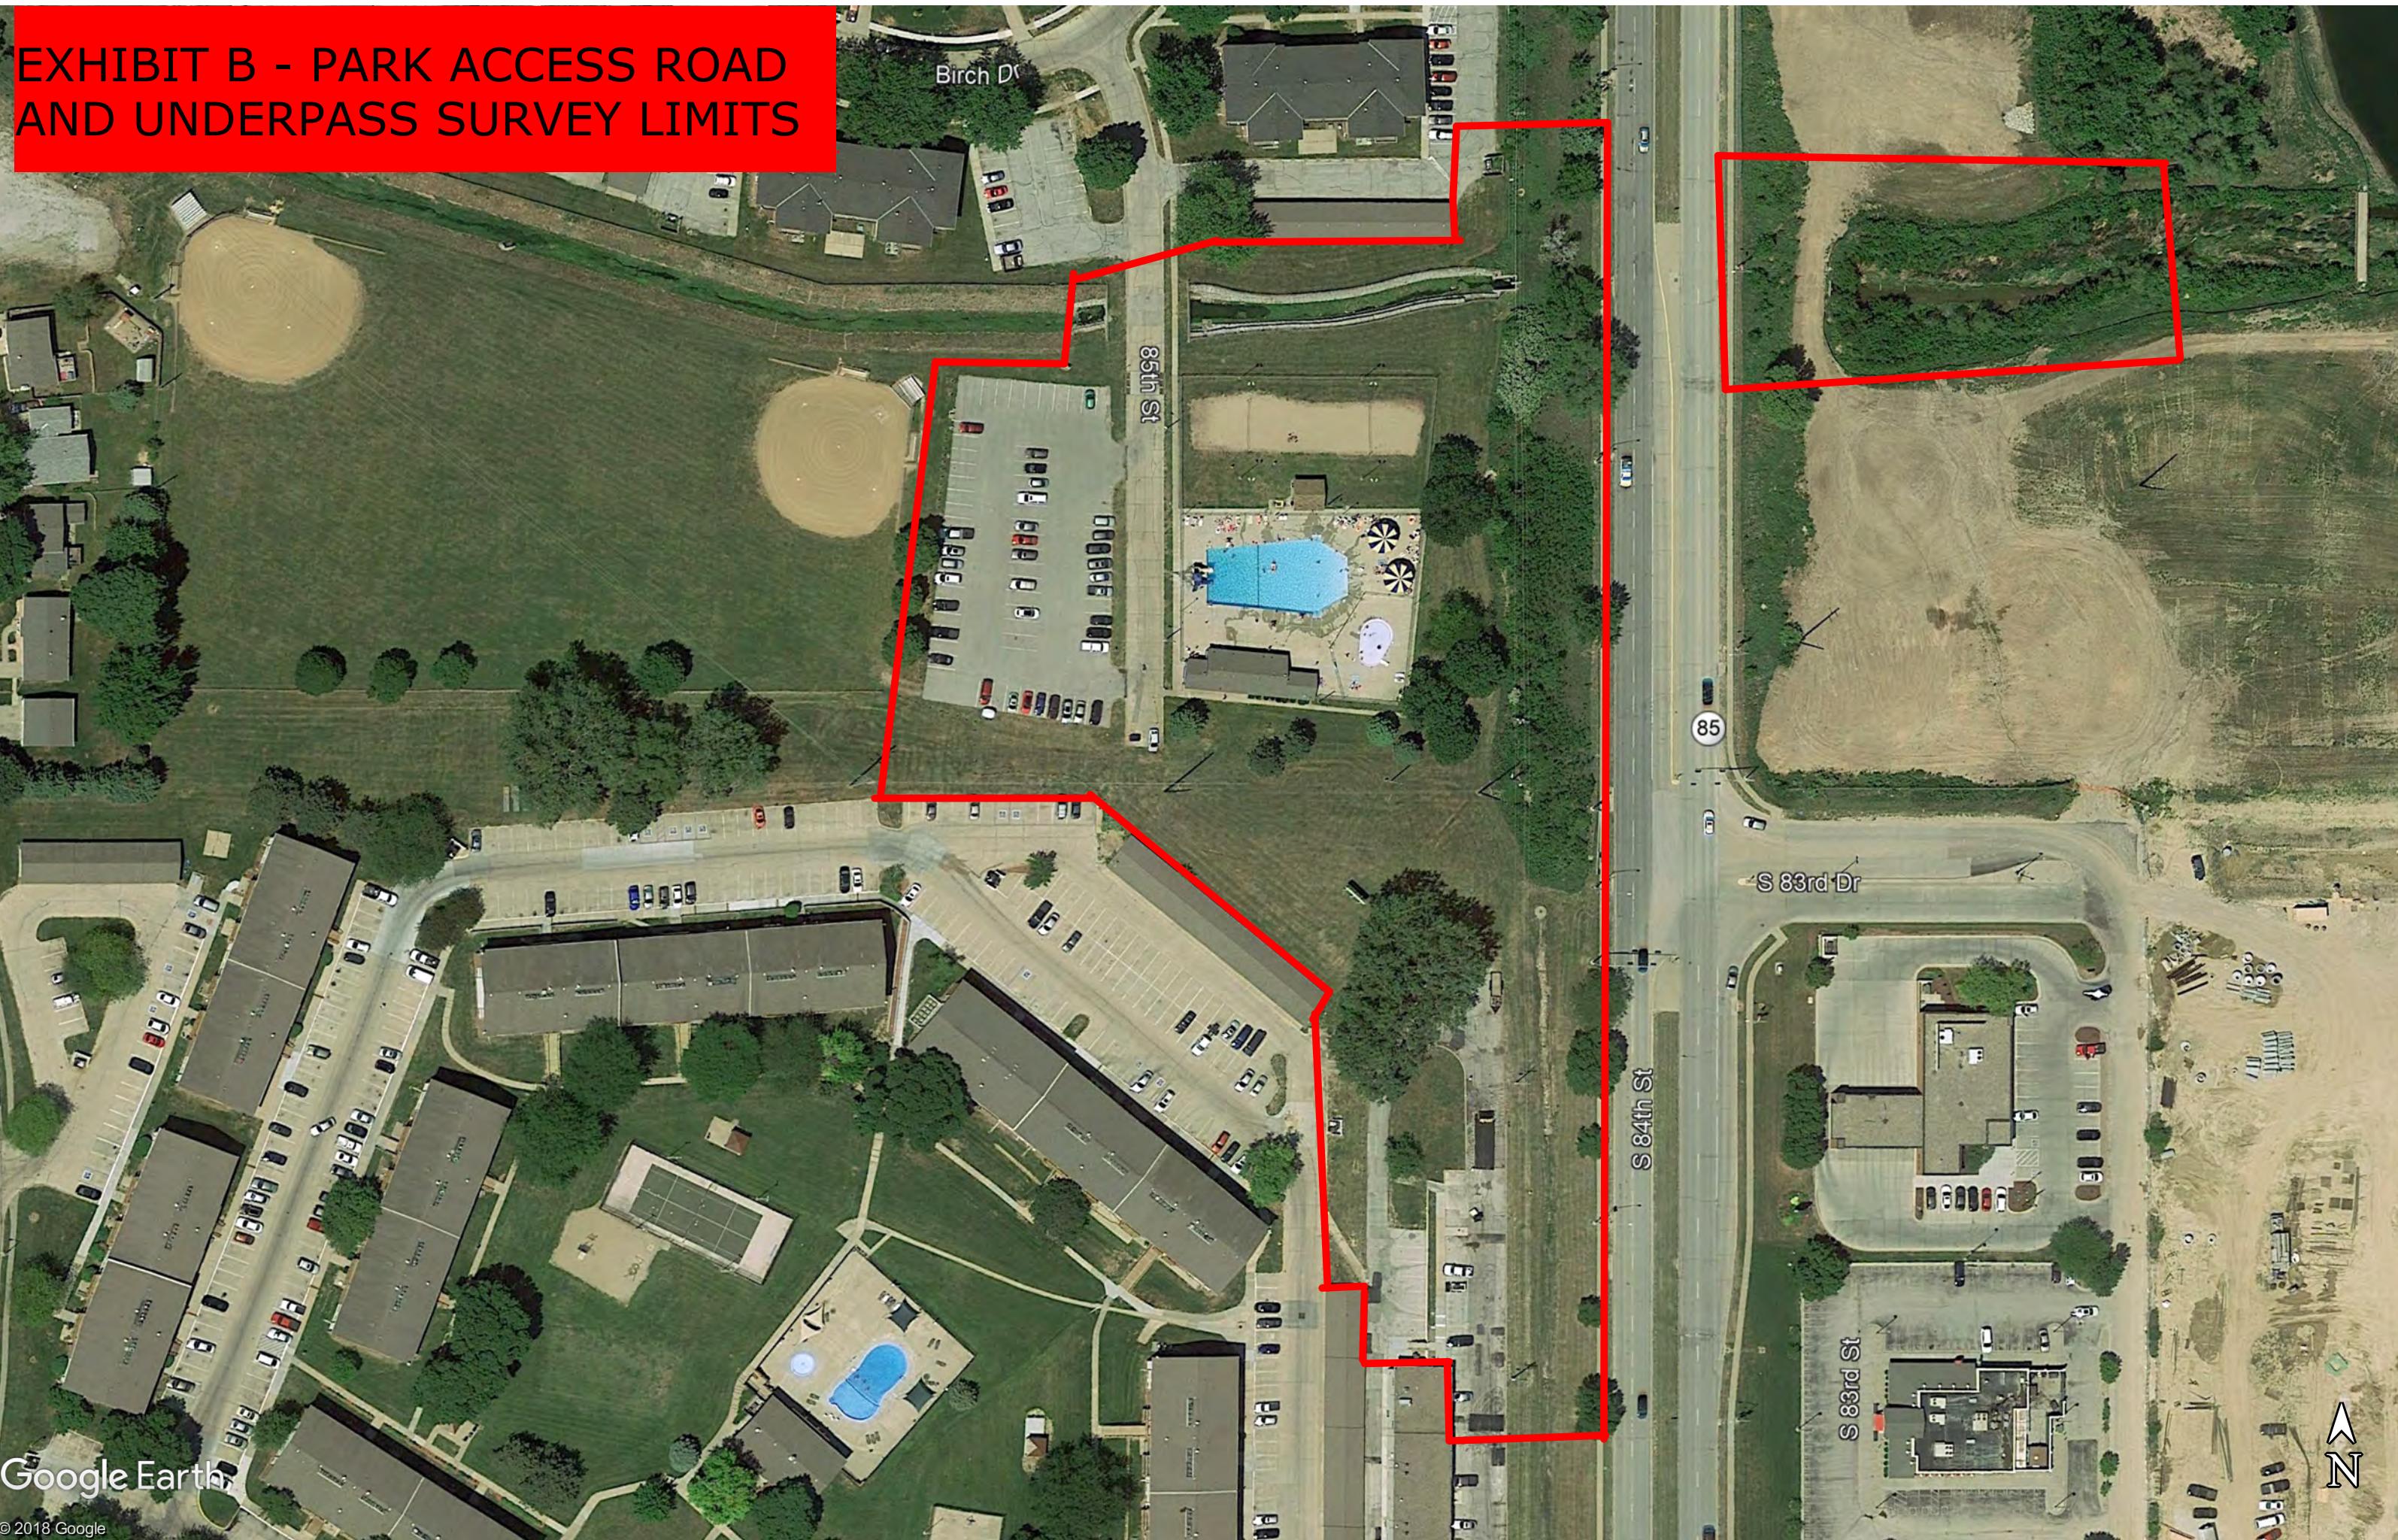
EXHIBIT B - PARK ACCESS ROAD AND UNDERPASS SURVEY LIMITS
